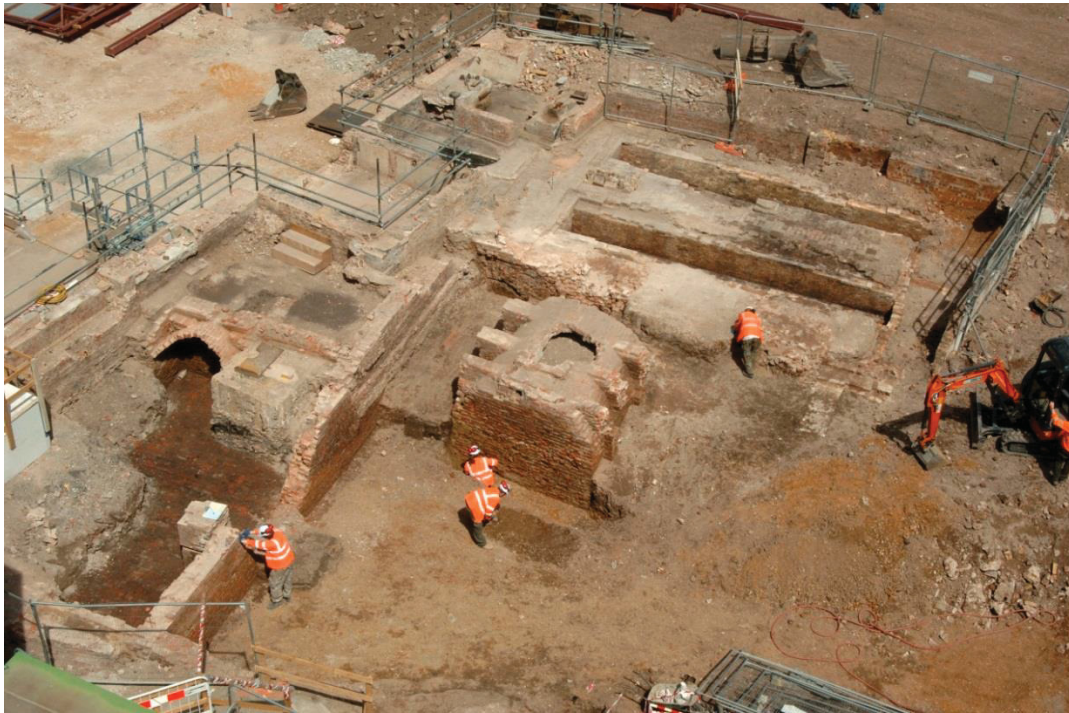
View of 17th to 19th-century wall foundations and circular soak-away in southern area of site, looking east
